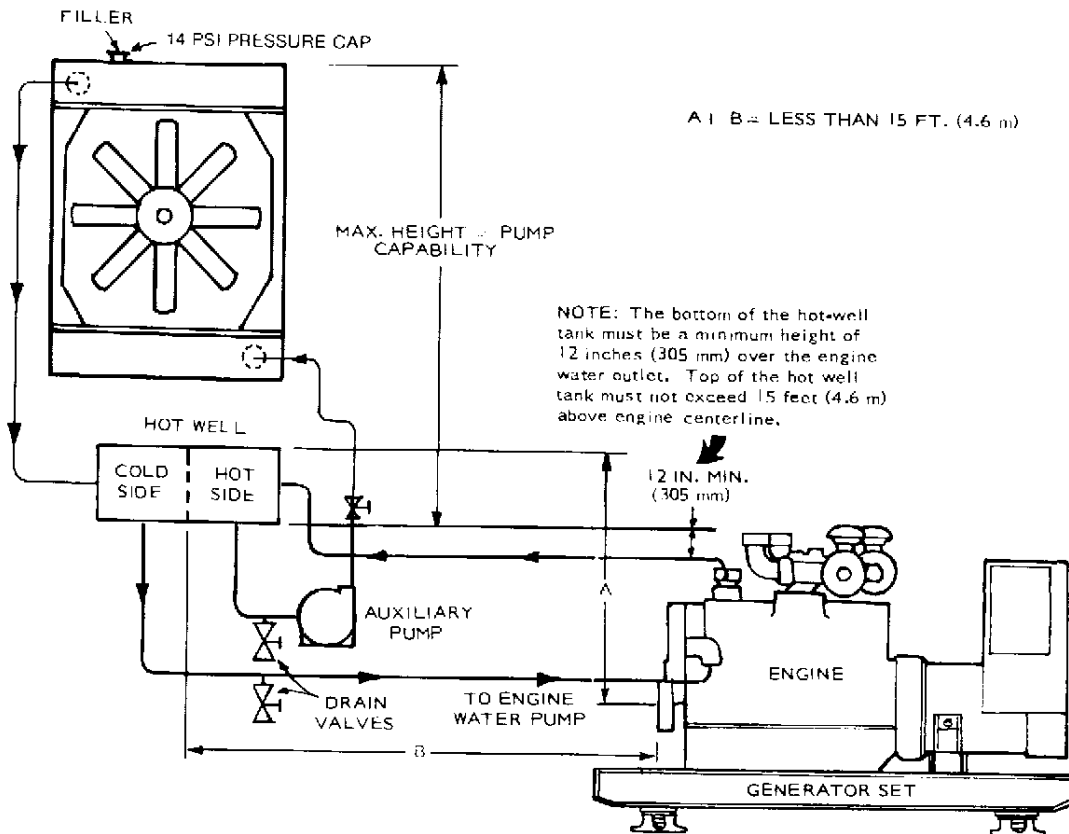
HIGH REMOTE RADIATOR INSTALLATION
